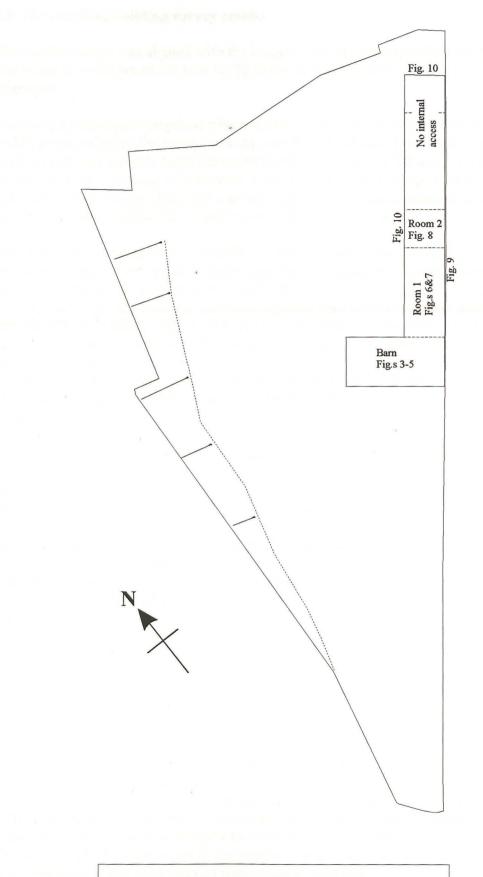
Plan showing buildings recorded during survey, 1:500. For greater detail see figs. 3-10.
